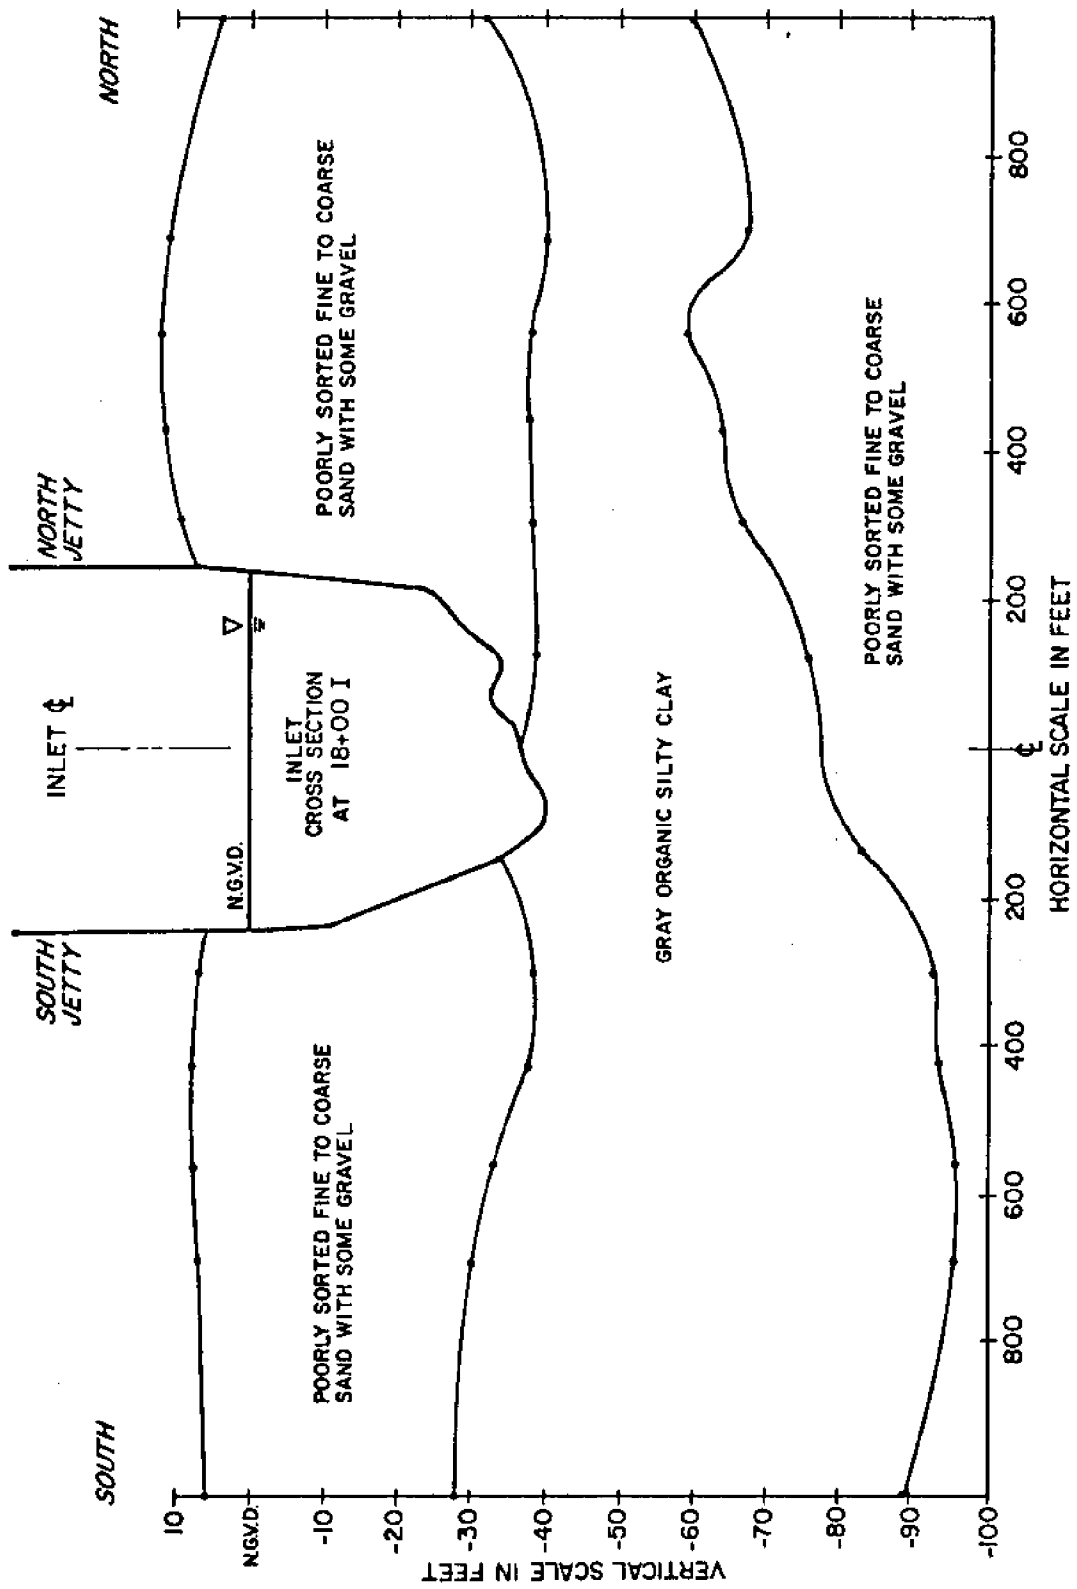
Inlet Cross Section Showing Location of Clay Layer
